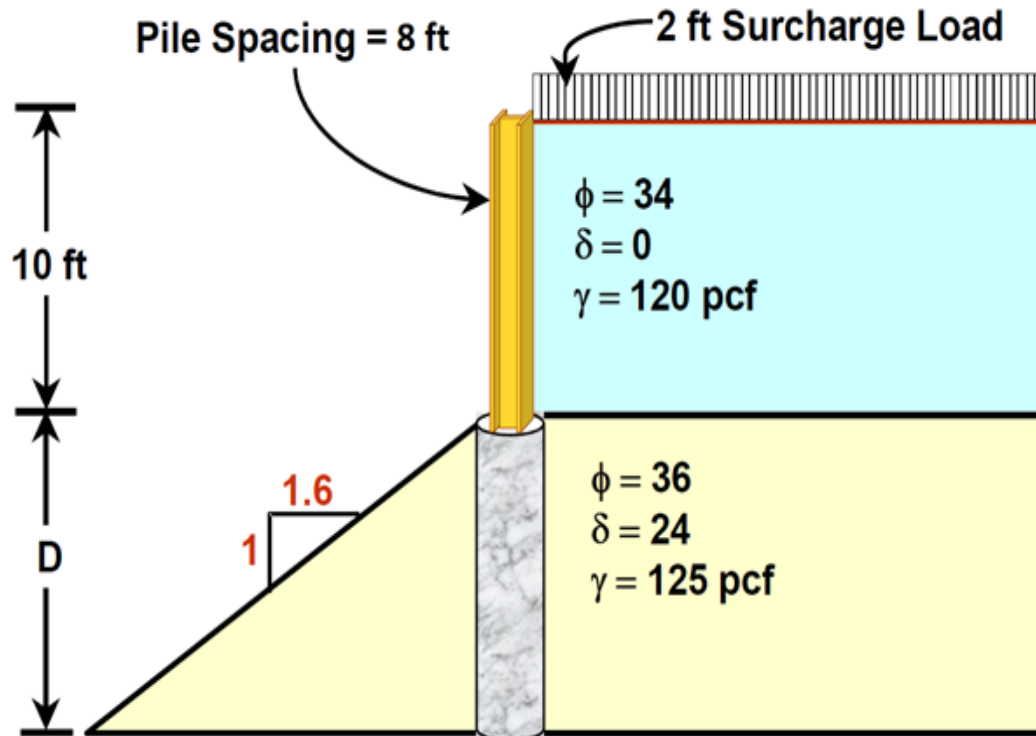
Soldier Pile Wall with Sloping Ground, Example 7-3
